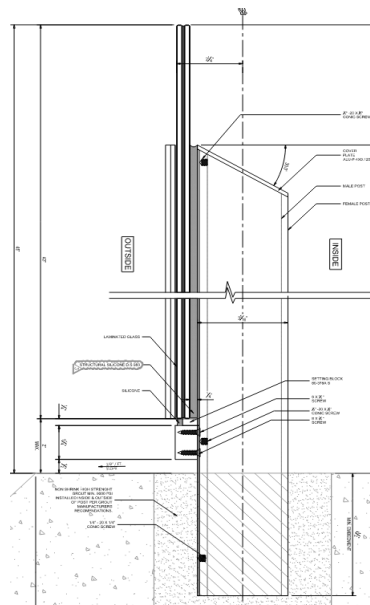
Section Detail of Laminated Glass Balcony Guard Supported on an Aluminum Post Anchored Into The Slab Edge
